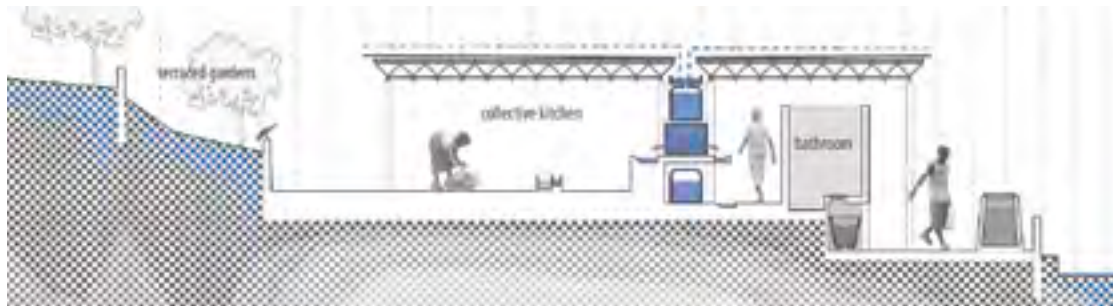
Section through the bathhouse and collective kitchen showing porosity of the ground.
